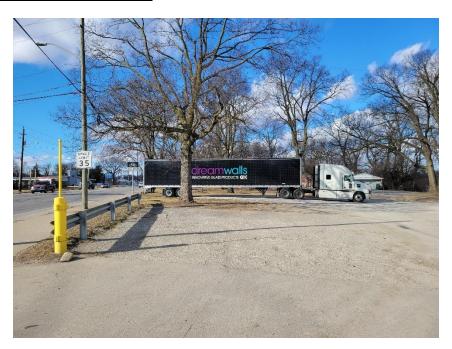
Gravel Parking Area Partially Within ROW on Northwest of Subject Site Added 2020
